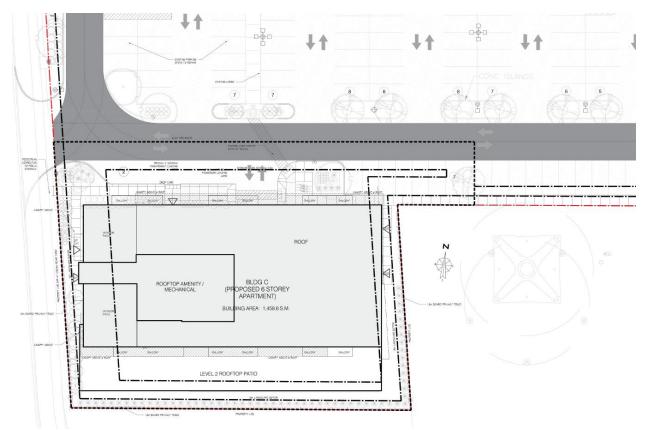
Concept Plan proposed Apartment Building 91 Southdale Road East.
